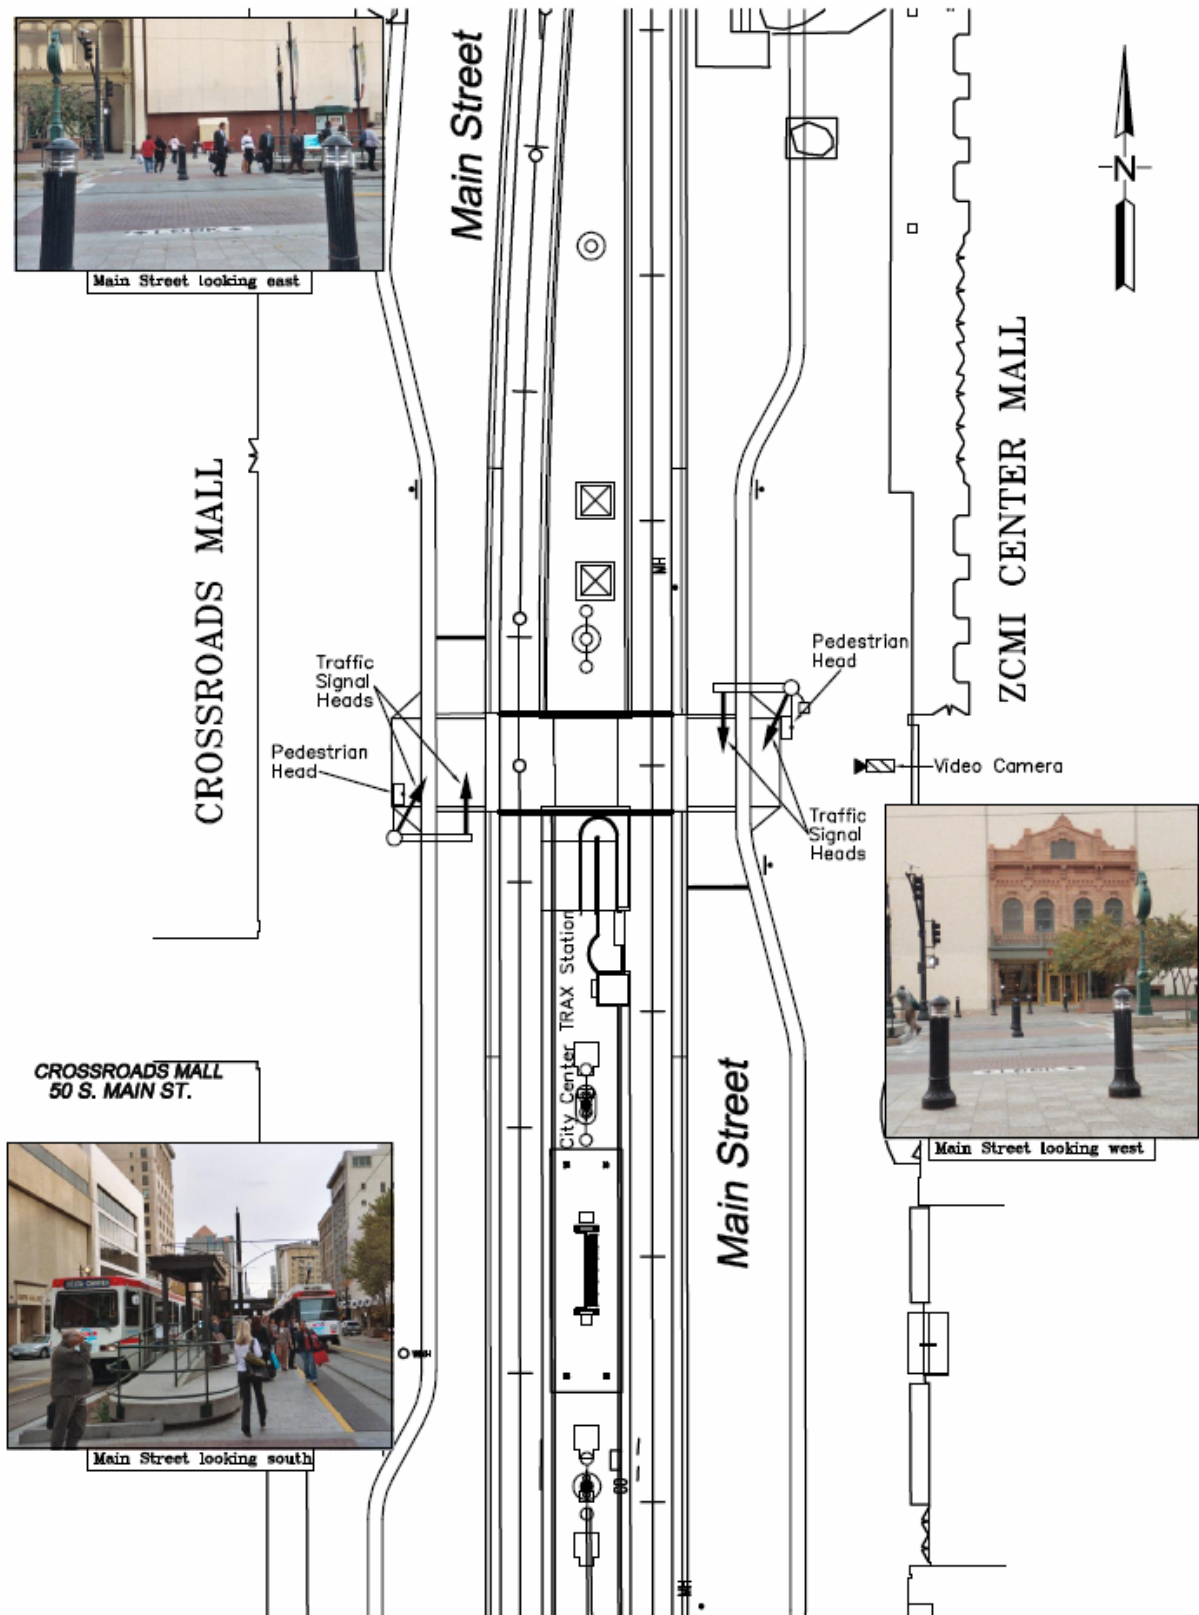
D-10 Field Test Plan Main Street Crosswalk
